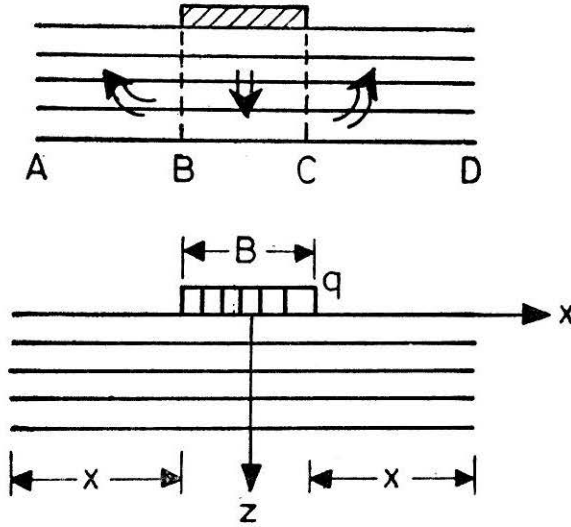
Assumed Failure Mechanism For Strip Footing on Reinforced Soil Bed
